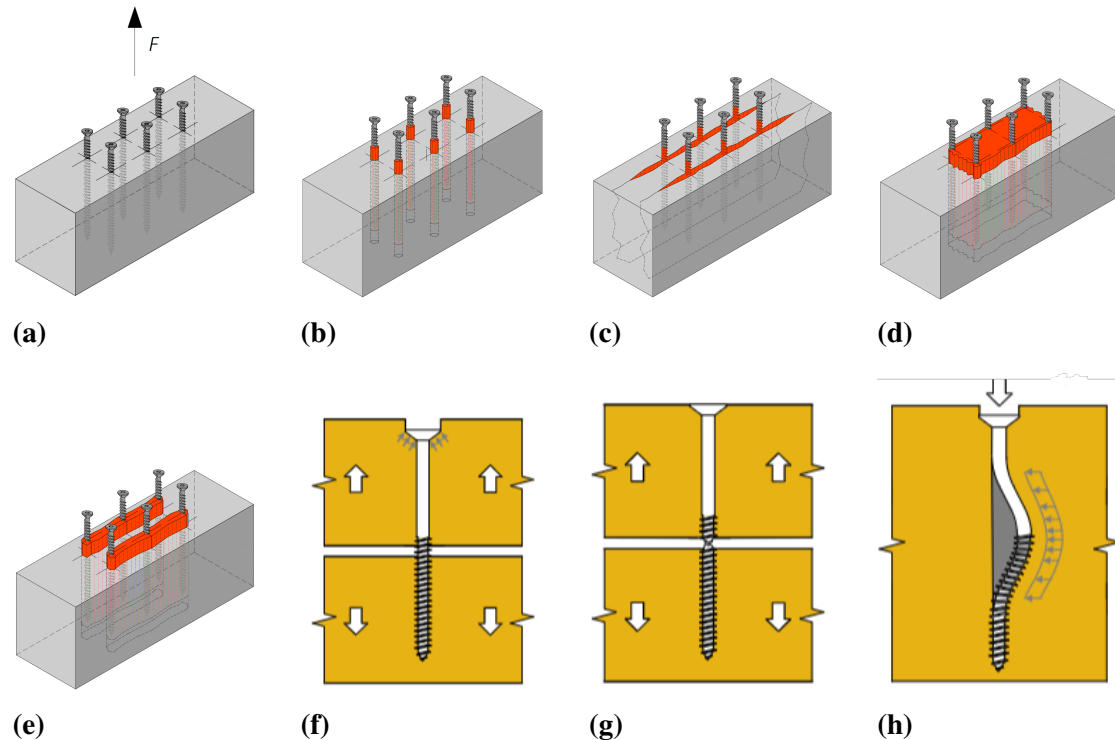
Failure modes of connections or fasteners subjected to axial loading. (a) Loading configuration, (b) withdrawal failure, (c) splitting failure, (d) block shear failure, and (e) row shear failure (Blaß et al., 2019). Adapted with permission. (f) Head pull-through failure, (g) Tensile failure, and (h) buckling failure (Jockwer, 2024a).
